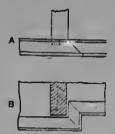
Elevation and Plan of Chimney-piece Cupboard Side,
